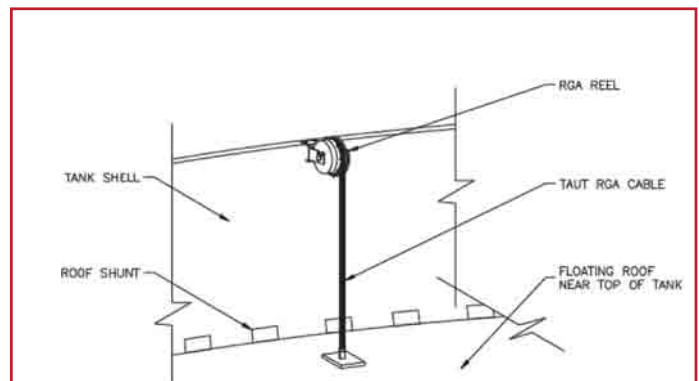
shows the RGA when the roof is high. Note how the RGA cable is as short as possible, thus providing the lowest possible impedance between the roof and shell.
